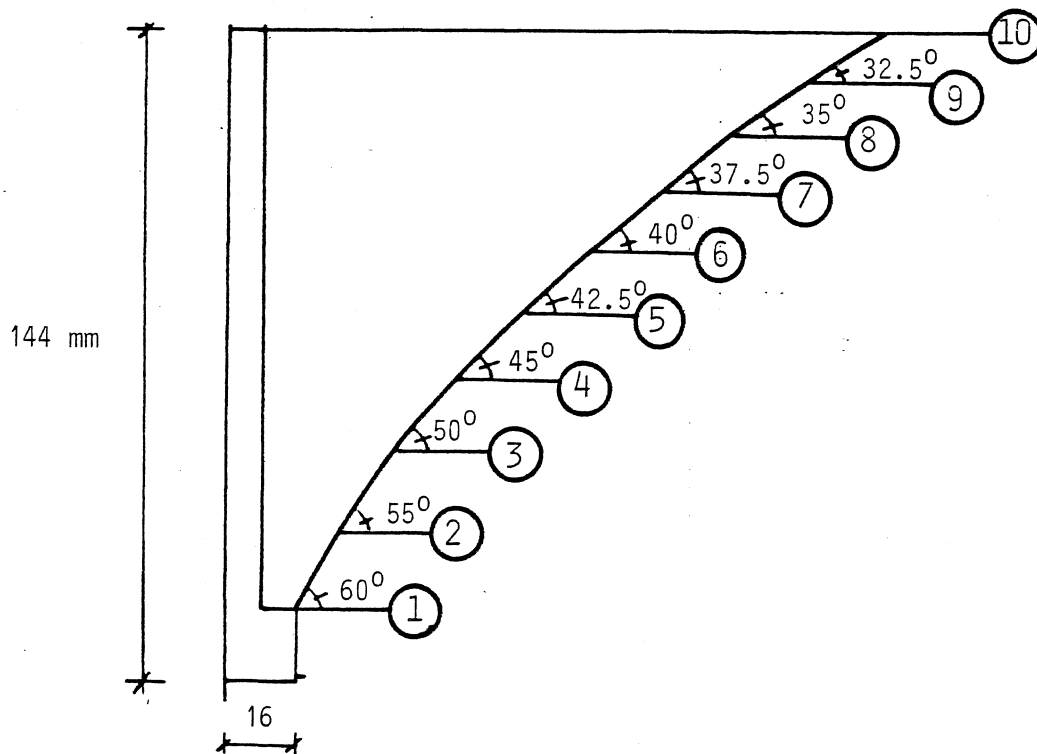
Anchor with inclined crack embedded in a cylindrical concrete foundation with a diameter of 2.8 m and a height of 0.8 m [5]
